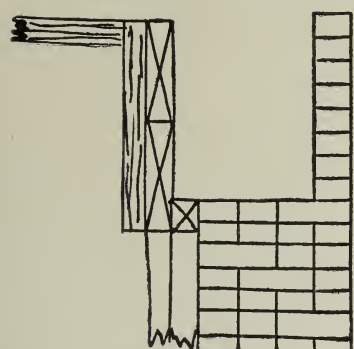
Wood Side Form for Concrete Girder in Brick Wall.
